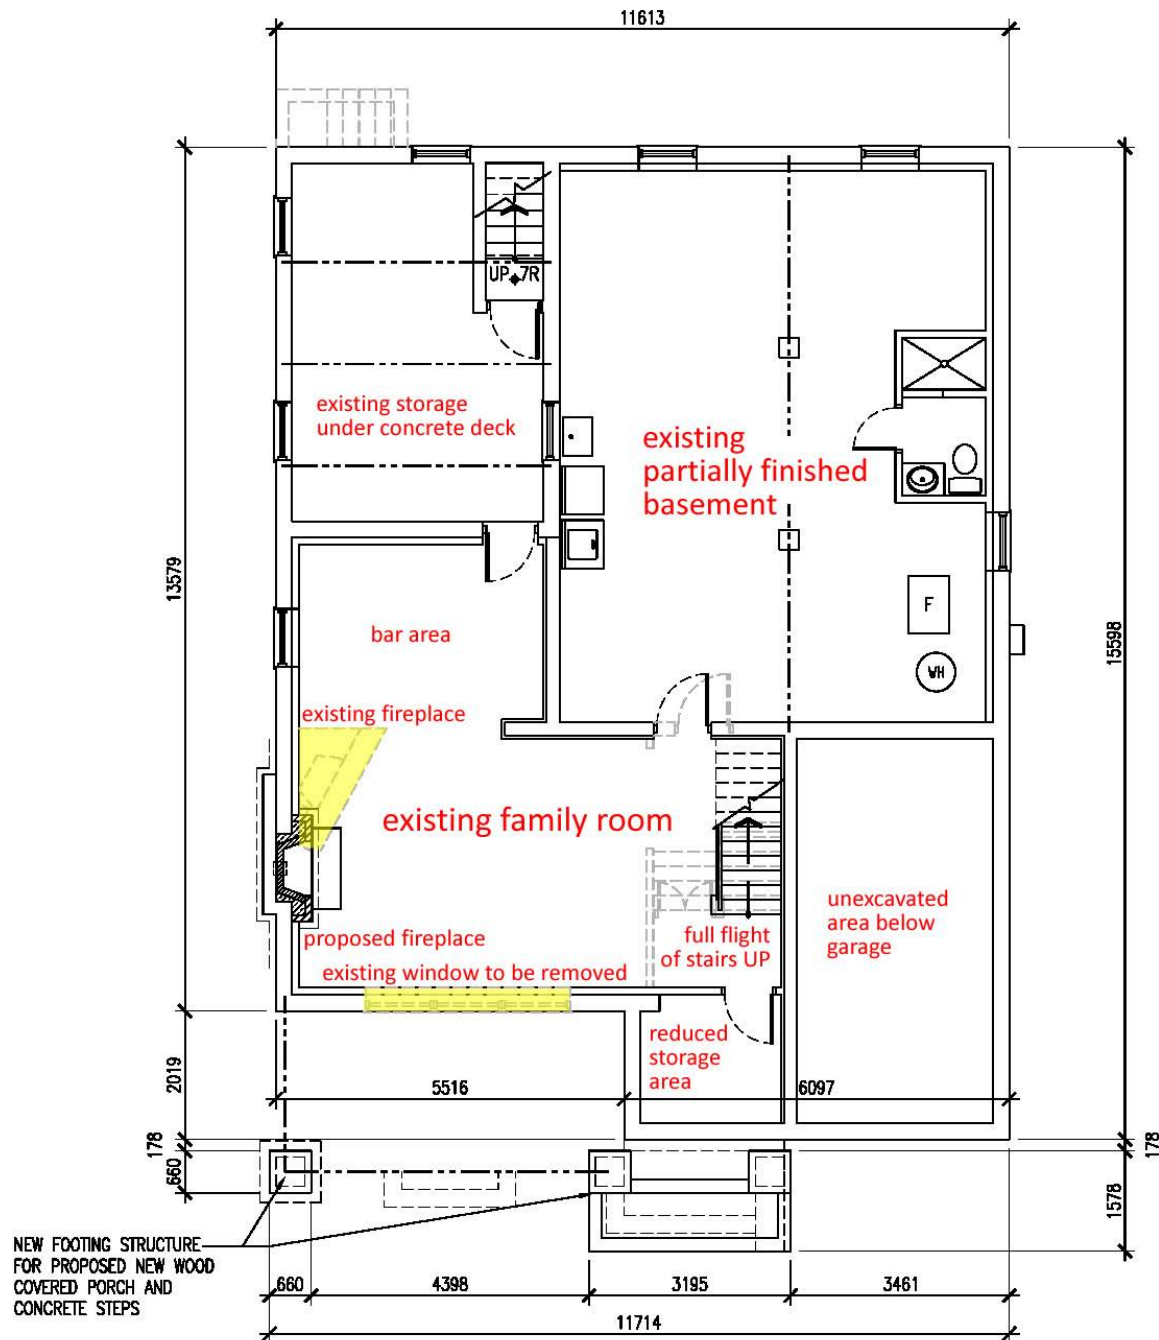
Proposed alterations to basement with existing features to be modified highlighted in yellow. With the entrance foyer to be raised to the main floor level, a full staircase from the basement will be needed and its direction reversed, thereby eliminating a portion of the existing storage area (with double doors).
